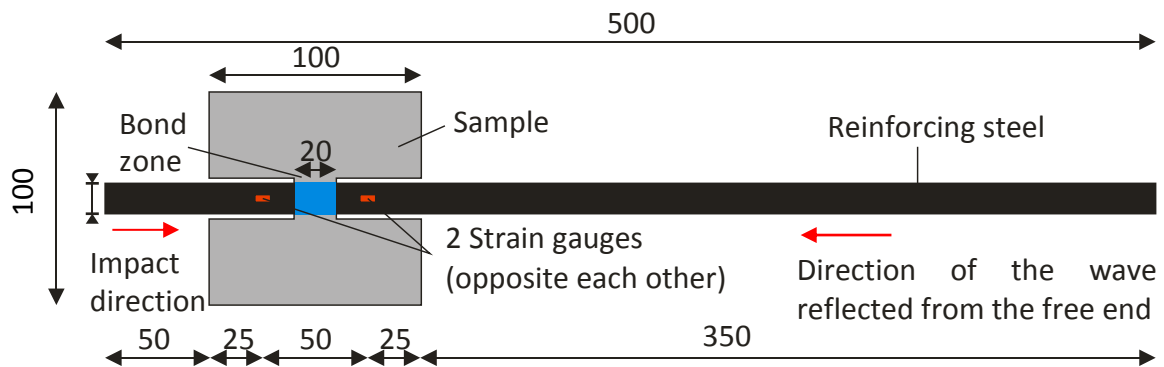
Location of strain gauges in the specimen for drop-tower push-in testing.
